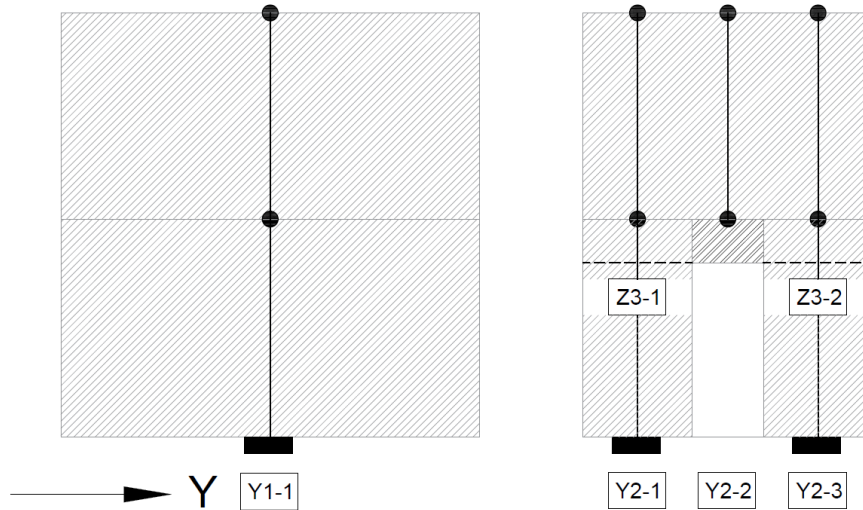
Piers arrangement for house WPL along Y axis: exterior wall (left); interior wall (right)
